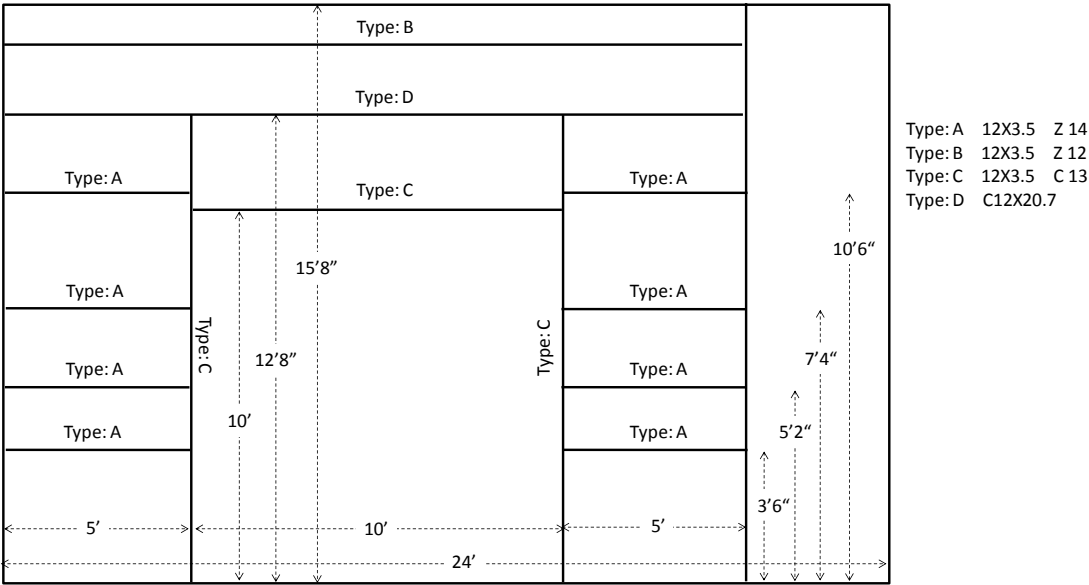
Cold-formed steel door framing (Gao and Moen 2009)
